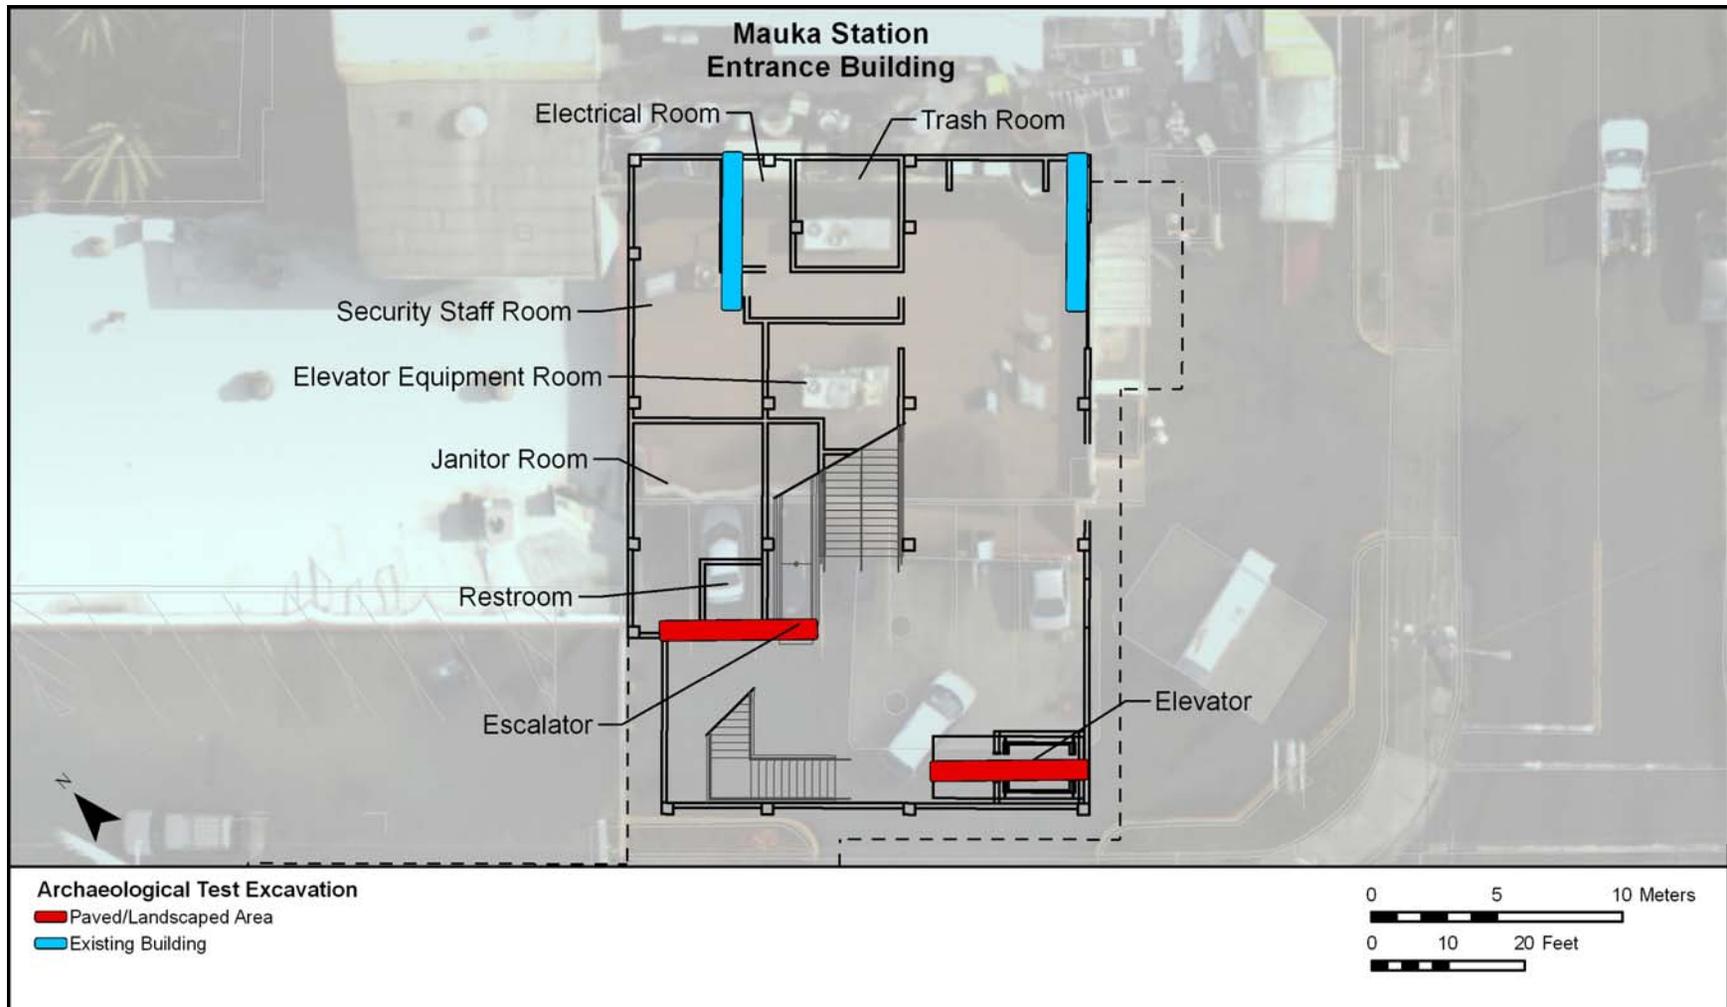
Kalihi Station, detail of (*mauka*) Station Entrance Building showing proposed locations for archaeological inventory survey testing (four 2' by 20' test trenches)
